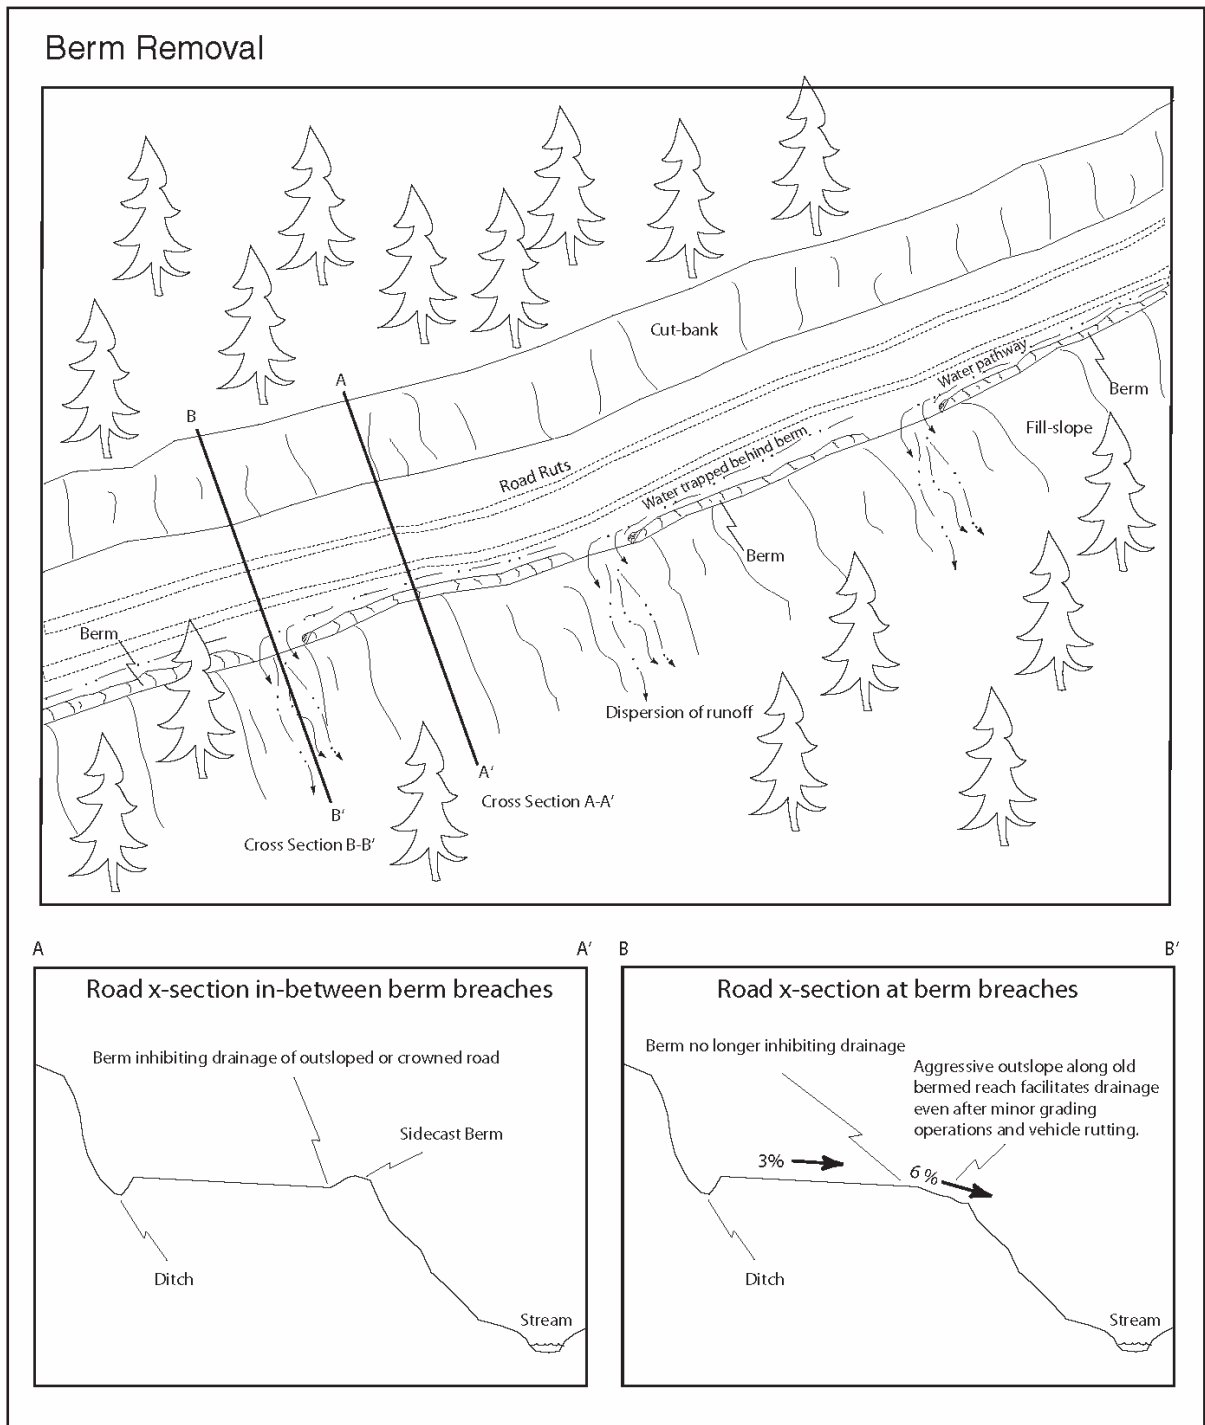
Berm removal for improved drainage on outsloped and crowned roads.
